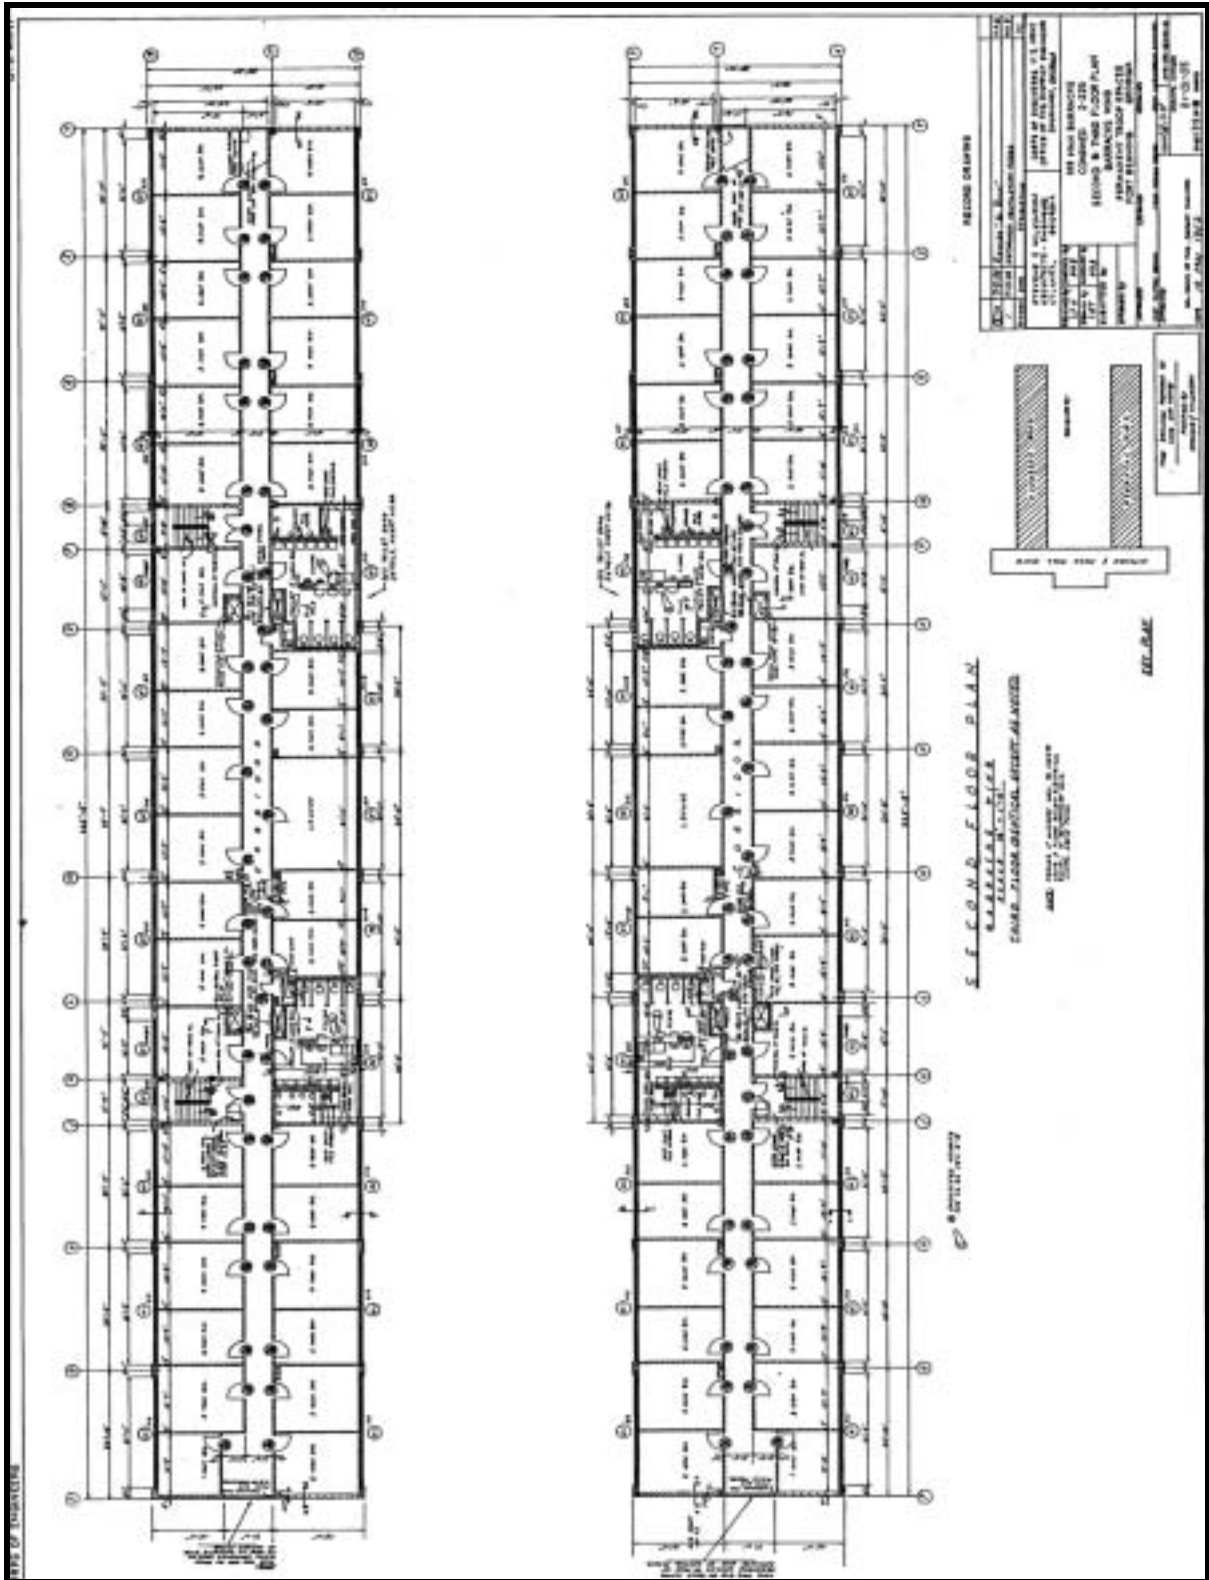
Double hammerhead barracks, floor plans, barracks wing (1952, revised 1954) Engineering, Ft. Benning).
